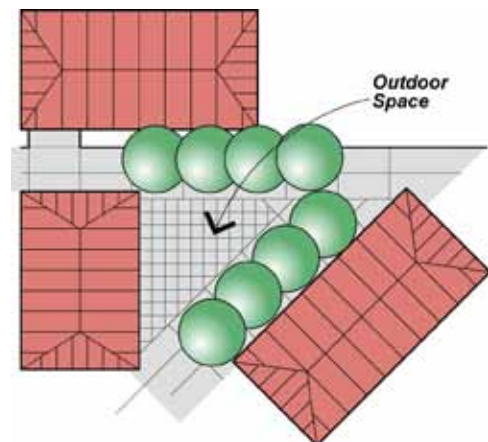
Outdoor spaces created by grouping buildings.
